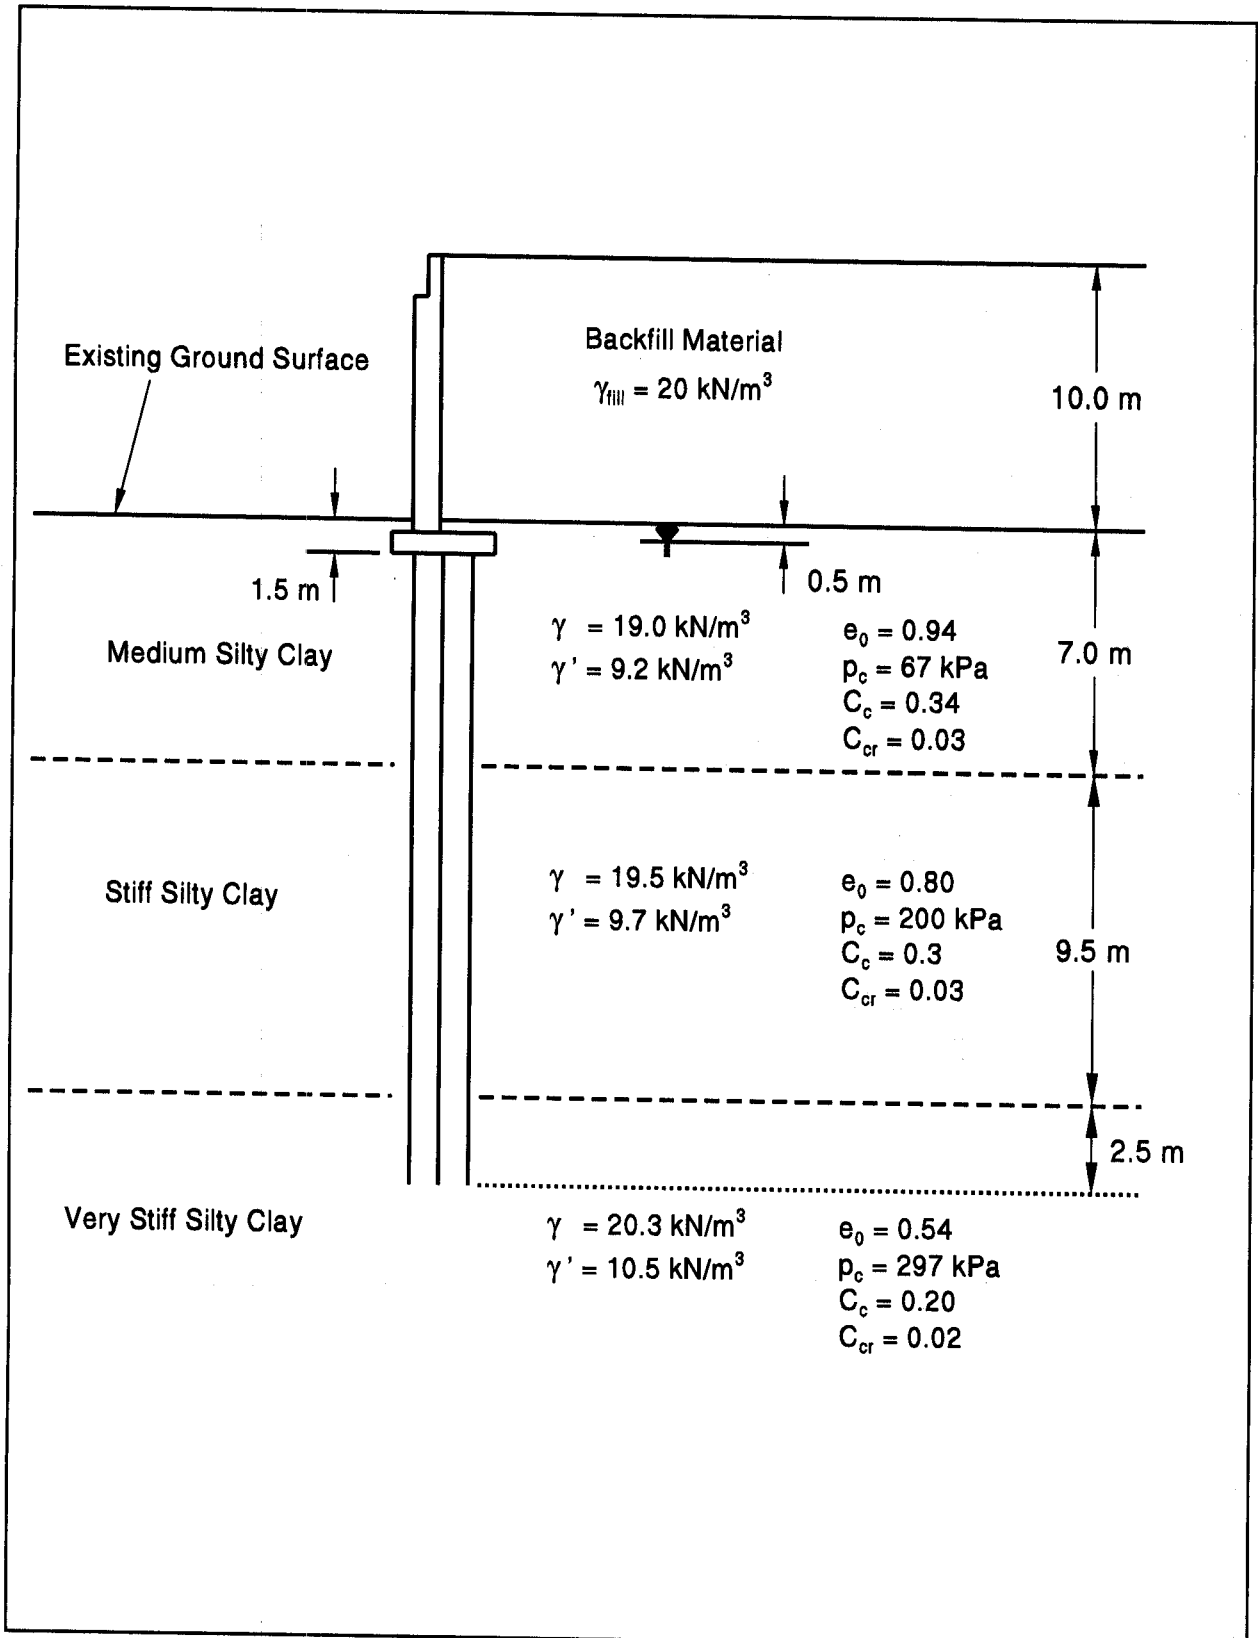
Schematic of South Abutment Showing the Backfill Material and Soil Profile
